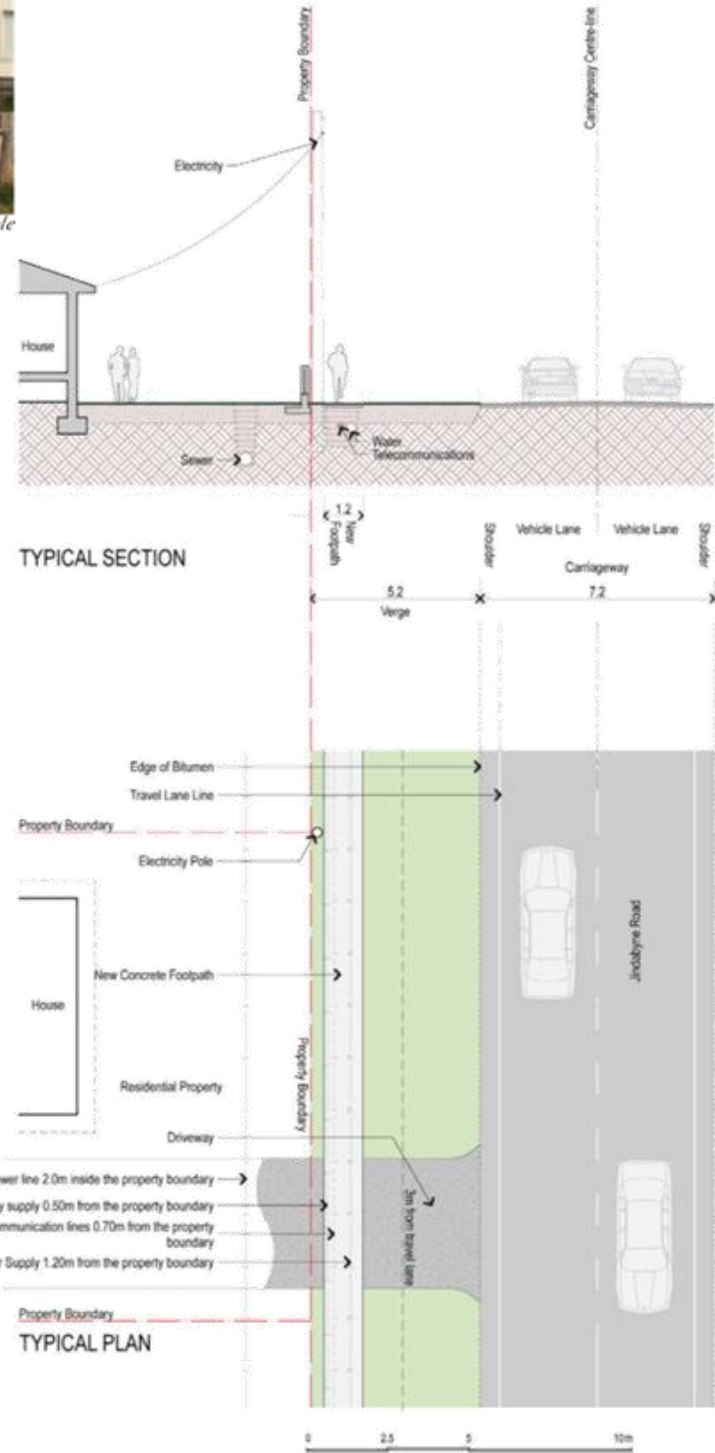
OPTION 2 - Typical section and plan of the removal of all trees with no replacement planting
